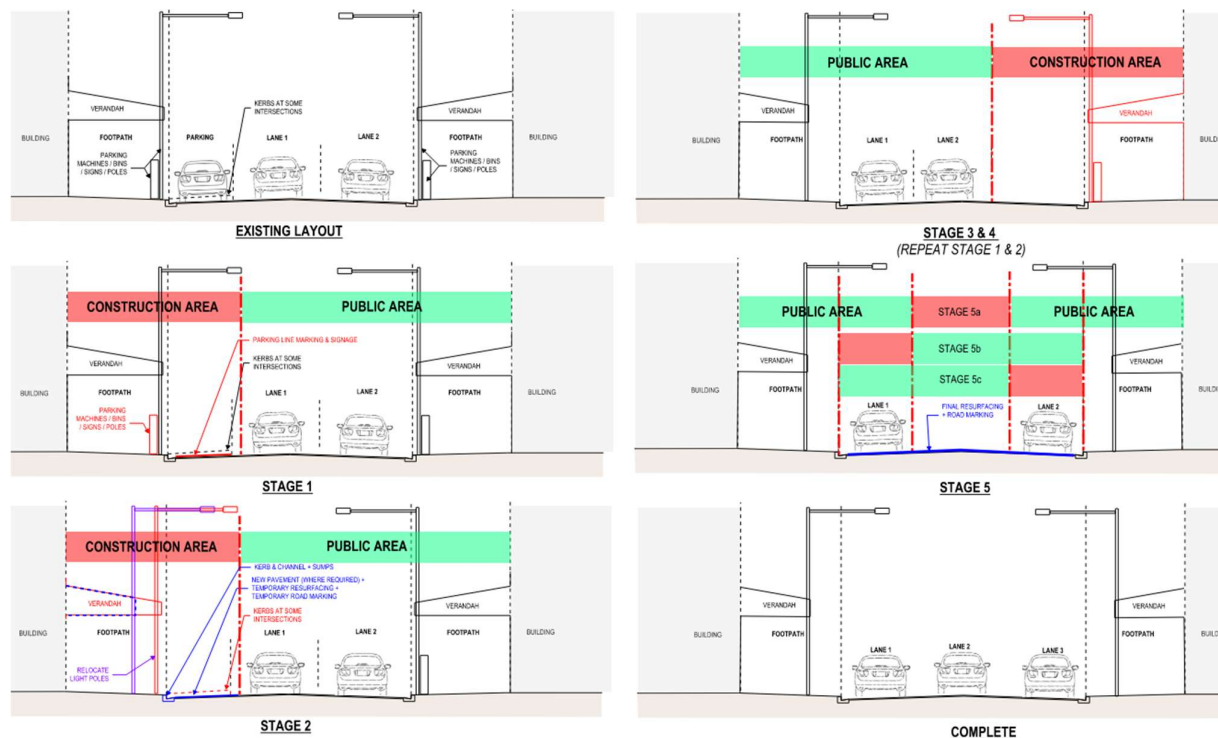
Potential Te Aro construction staging. The approach shown is typical for many areas of works along Vivian St.
